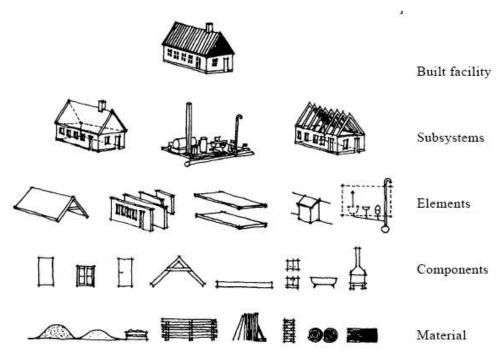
Level structure of built facilities. Things belonging to the levels: built facility, the principal subsystems, building elements, building components and building material.
